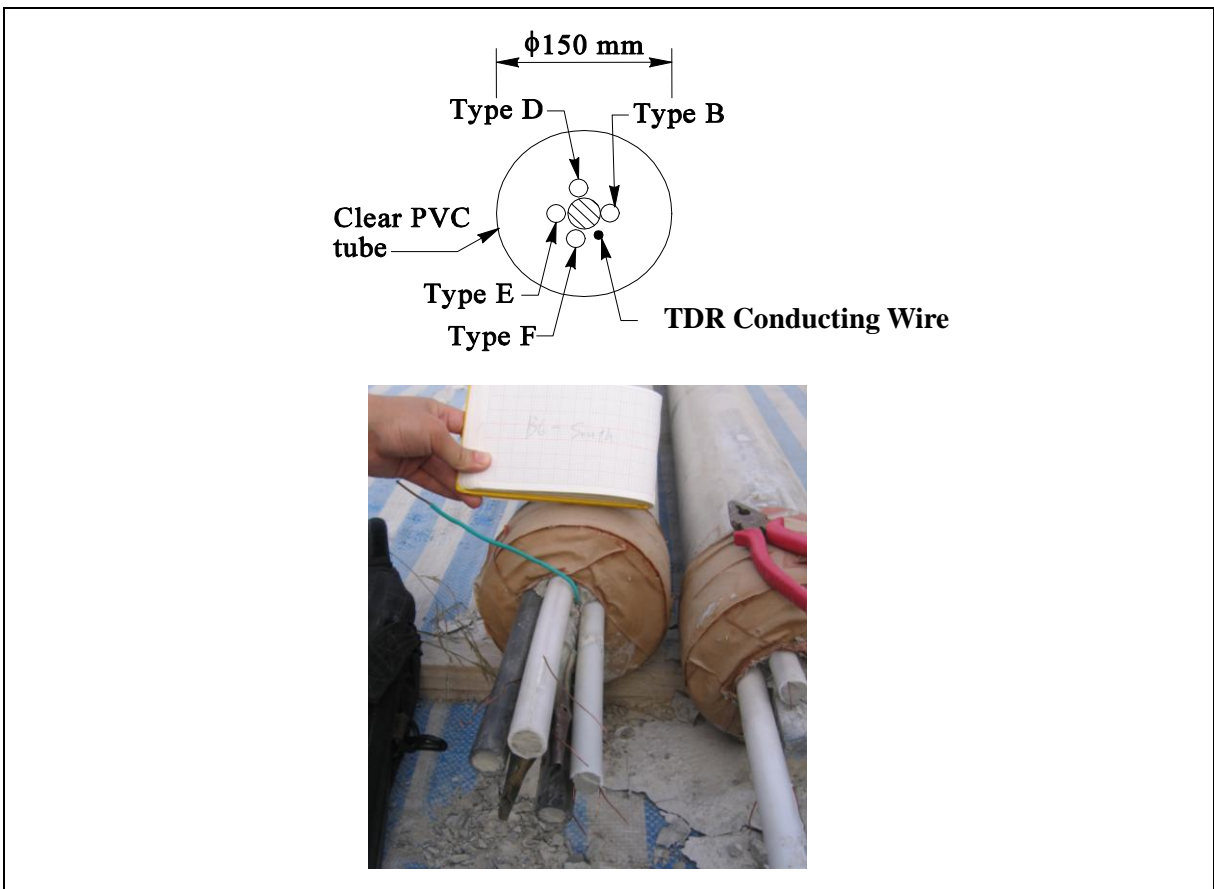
Typical Cross Section of the Prefabricated Soil Nails
